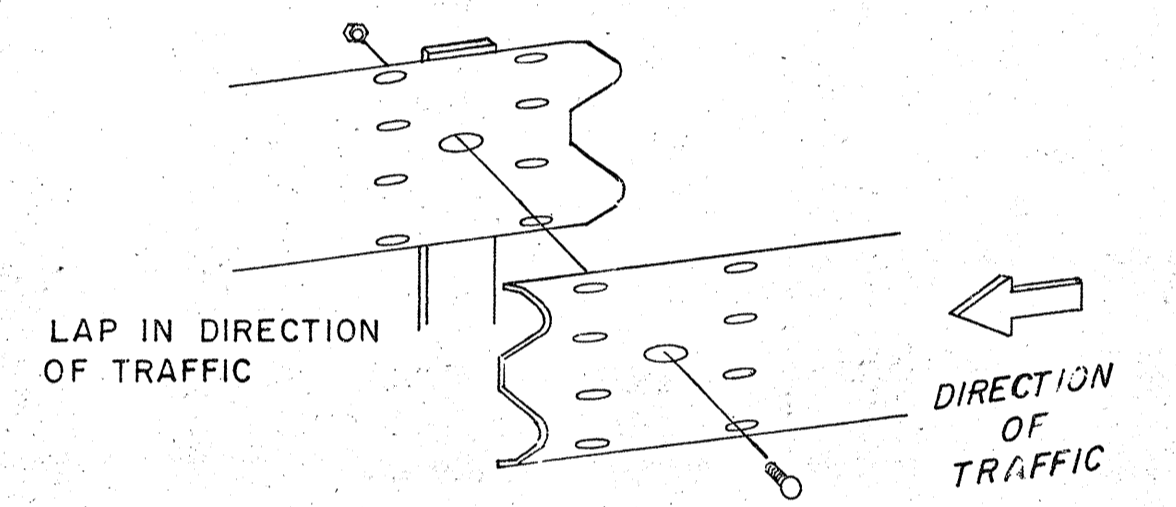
DETAIL "C" TYPICAL RAIL ELEMENT CLASS A, TYPE 2
